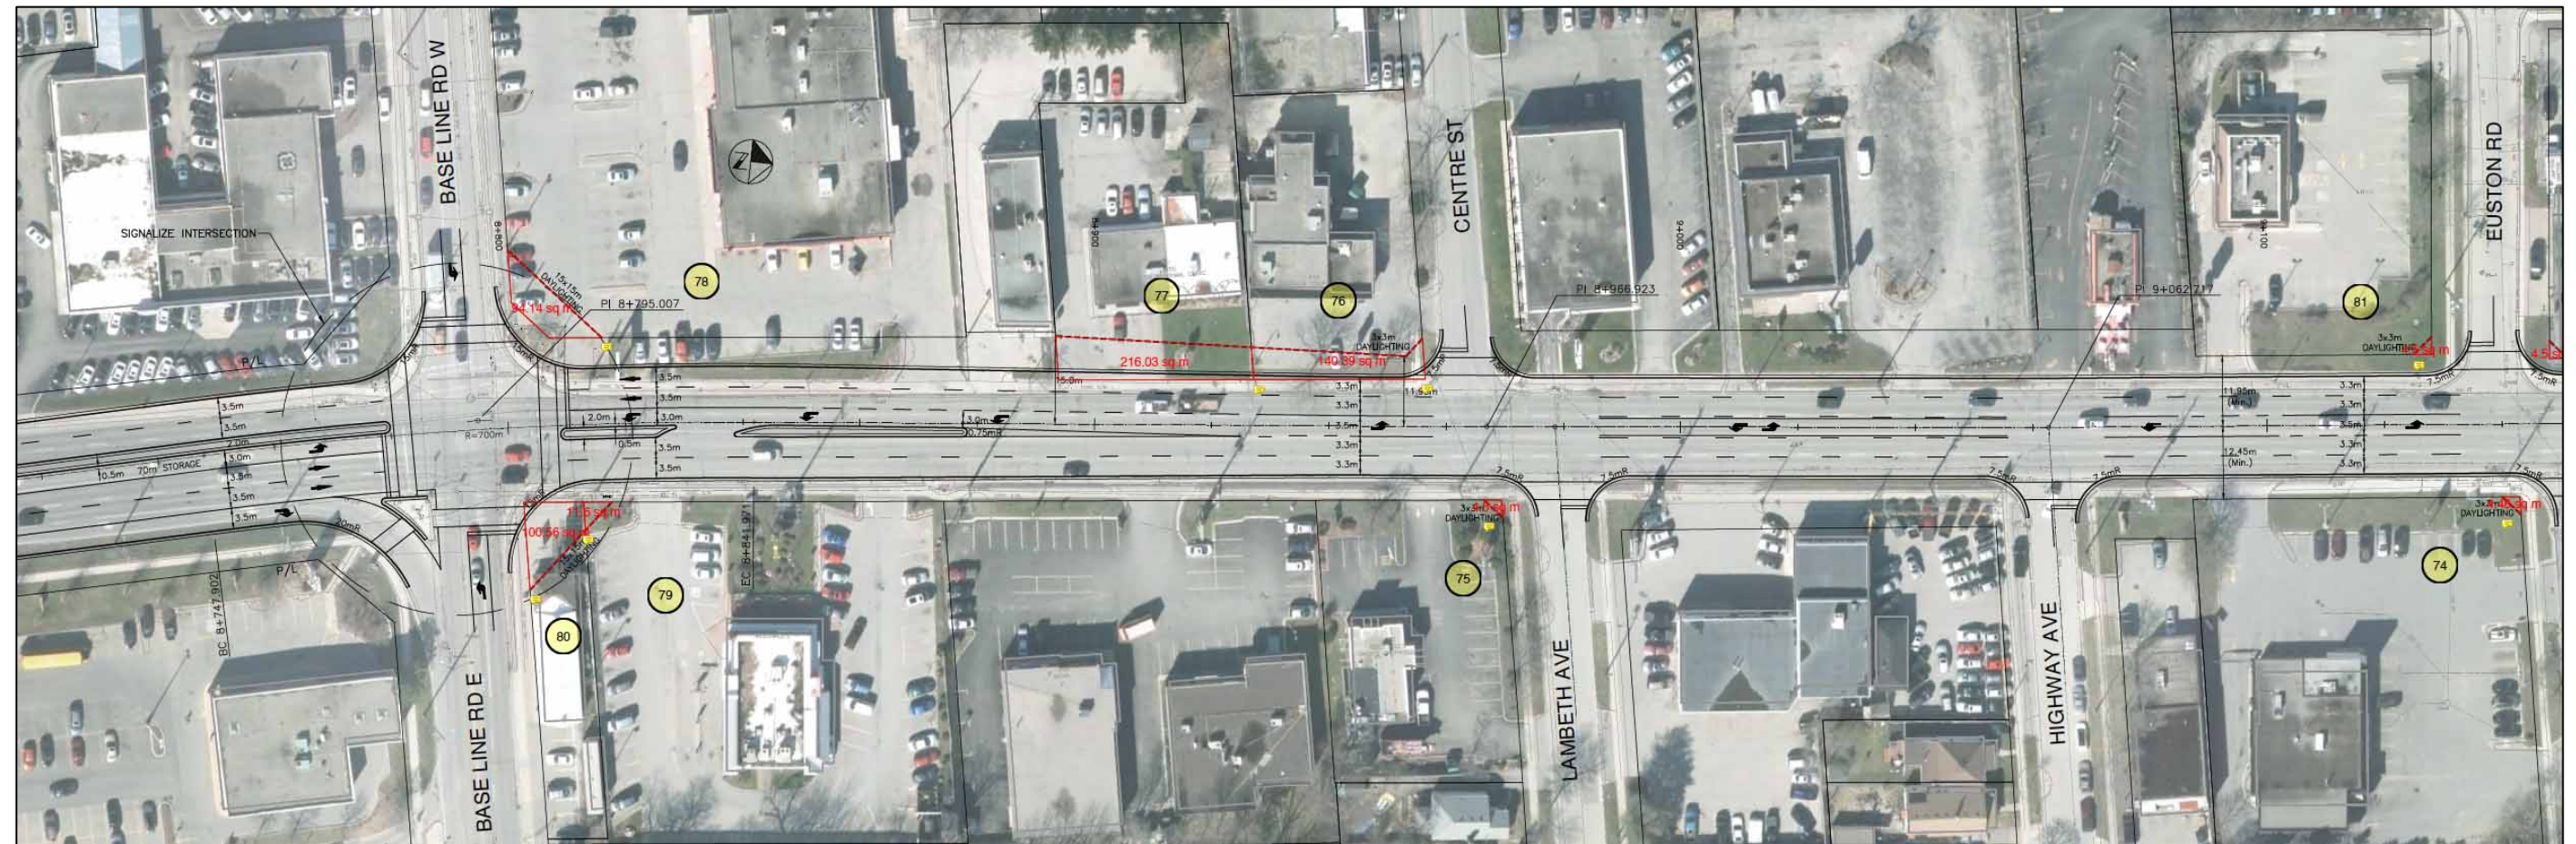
Section of the Wharncliffe Road South study corridor from Euston Avenue (right) to Base Line Road East/West (left) [Wharncliffe Road New Construction Alternative (Commissioner to Briscoe), MMM Group, Preliminary Plan, October 2015].
